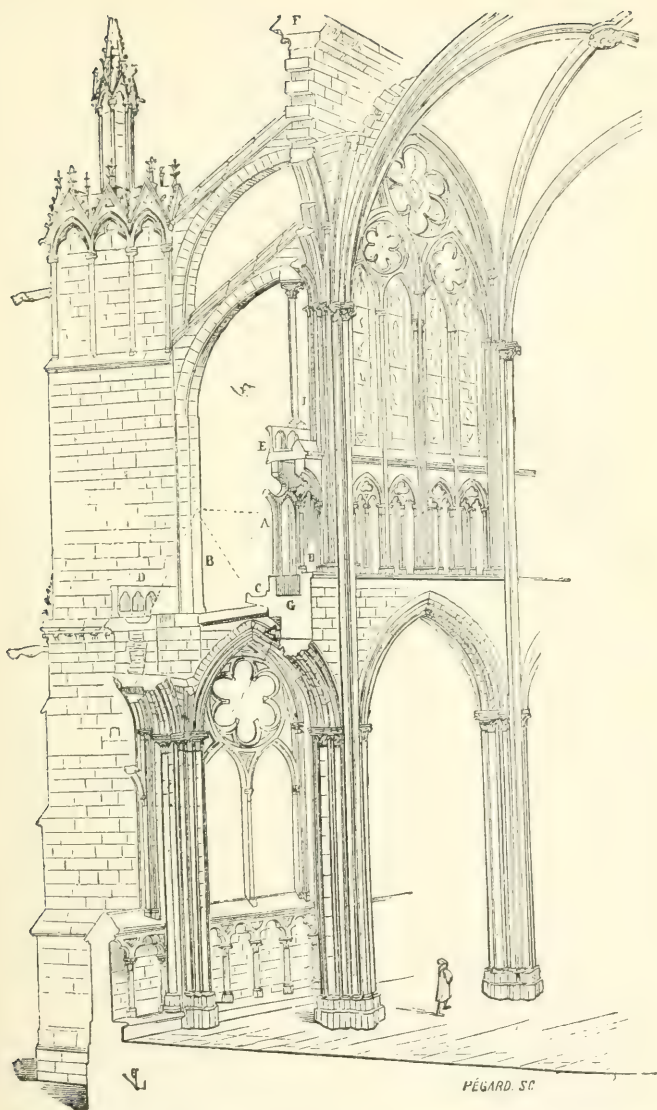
PLATE XXXIX.—Section showing construction in the Church of St.-Denis.
